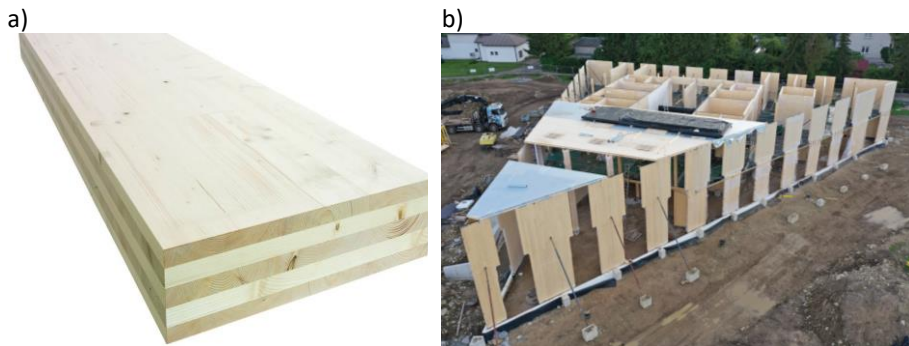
An image of a 5-layer CLT panel (a) and a building construction made of CLT panels (b).
